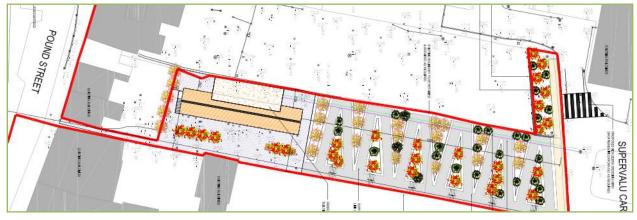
A site layout plan detailing the proposed pedestrian link and urban park connecting the existing Supervalu Retail Complex with Pound Street in the context of the new Creative Hub.
